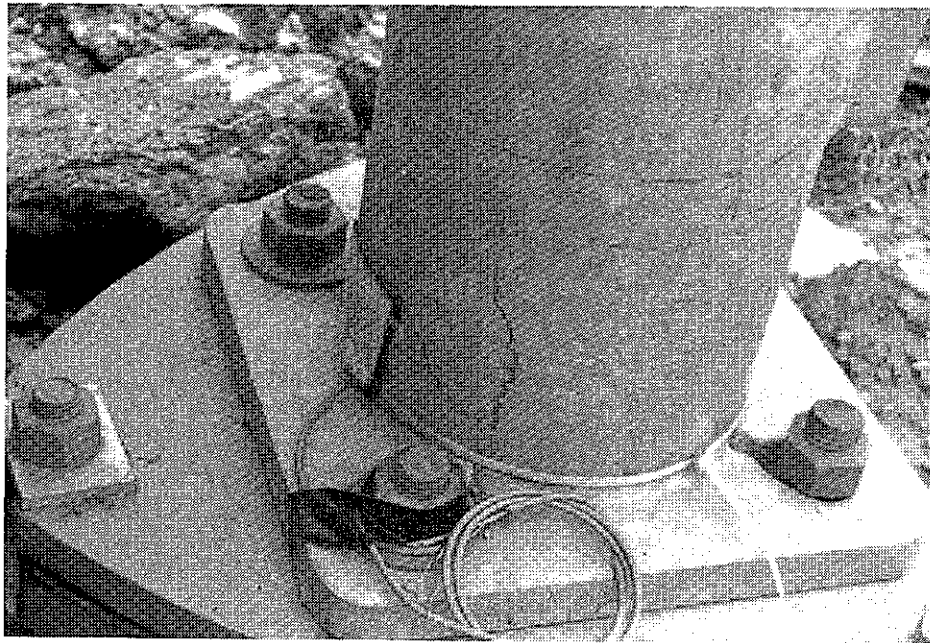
B. PROTOTYPE POLE SURFACE GAUGE
